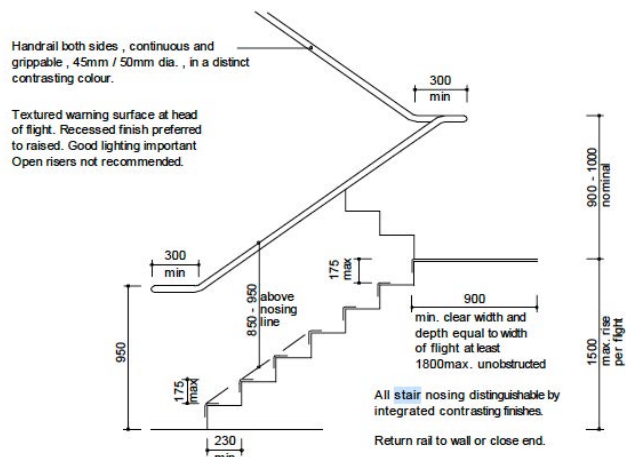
Stairway & handrail detail (Department of Public Works, 2001:23)
